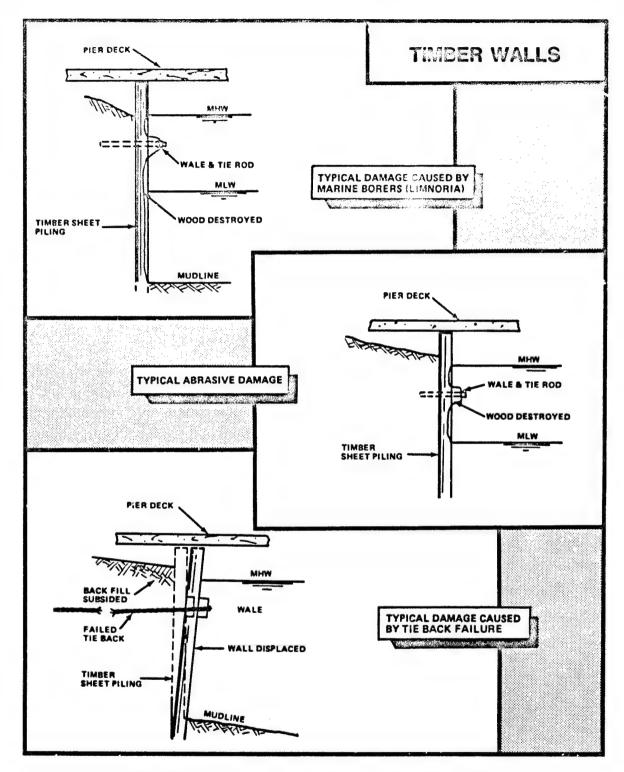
Typical Damage to Timber Sheet Piling from Marine Borer Attack, Abrasion Damage, or Tie-Back Fallure.
